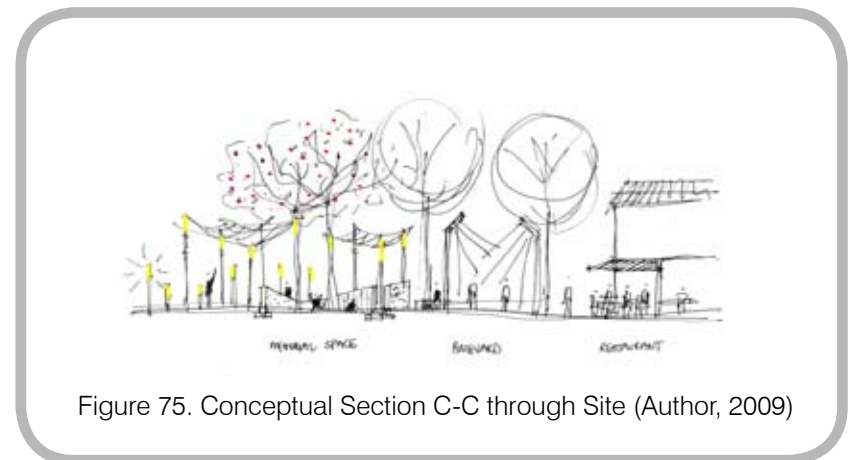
Conceptual Section C-C through Site (Author, 2009)
